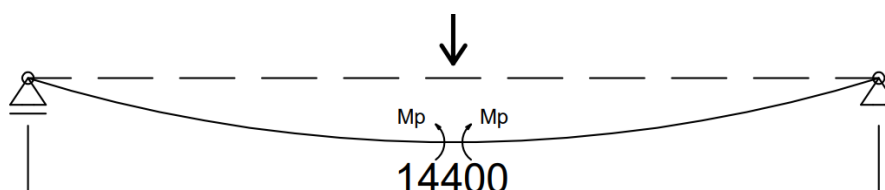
Interior or facade column removed at the midspan (7200 mm), beams supported by hinged connections
